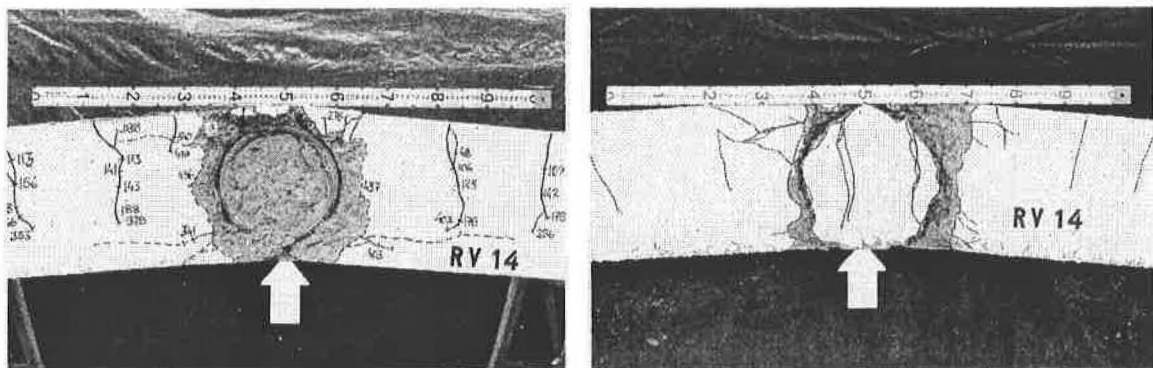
Final crack pattern of specimen RV14. Side elevation.
